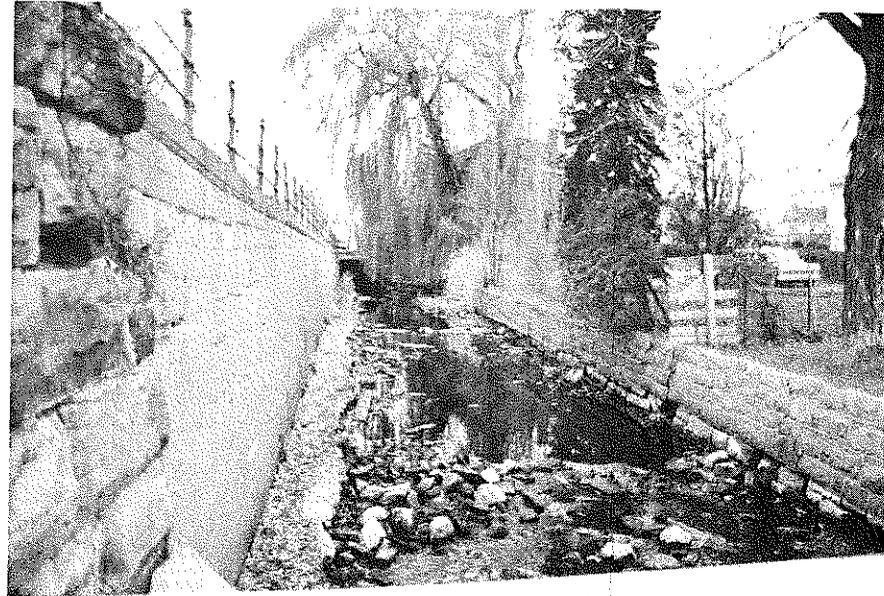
LOOKING UPSTREAM FROM THE OUTLET OF NORTH
